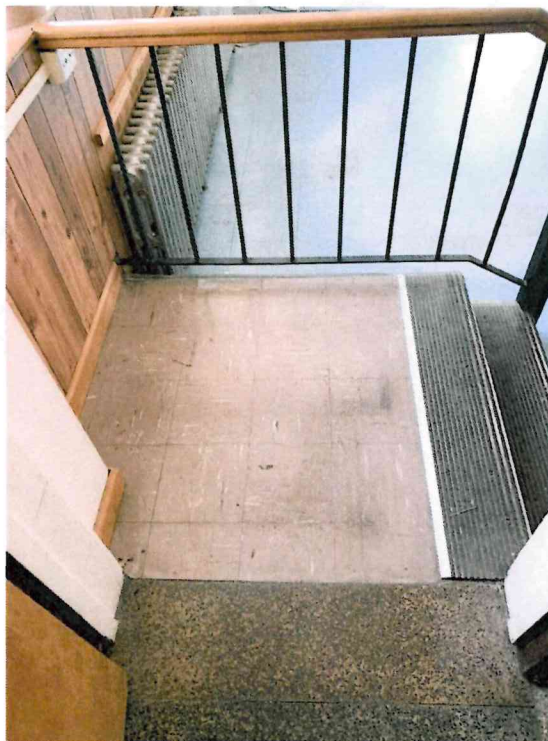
1st Floor Room 1 (northeast) – Typical brown/tan 9"x9" vinyl floor tiles identified as ACM shown. Asbestos containing floor tiles and mastic located beneath blue 12"x12" flooring.
